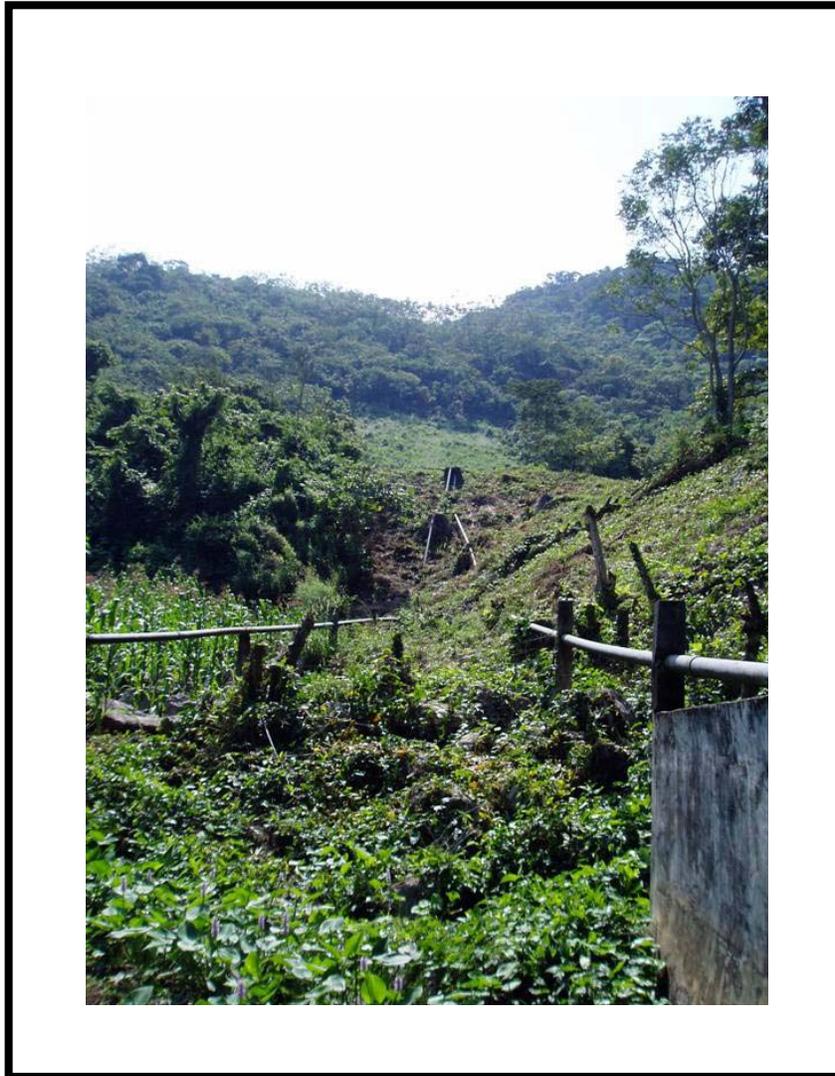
The new tube which will discharge into the Arroyo Sal will come down this hill, parallel to the existing pipes.
